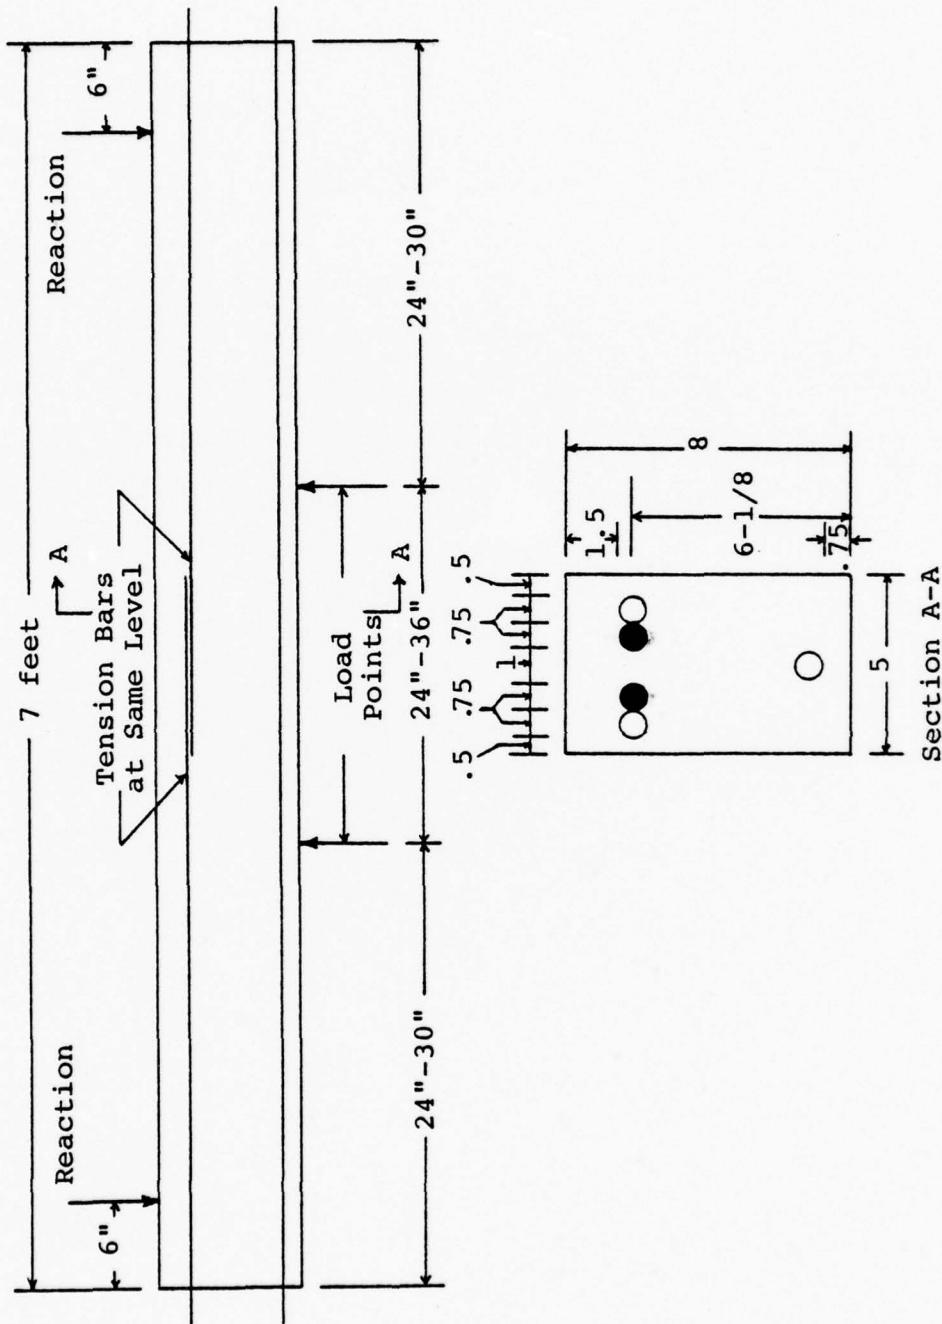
Nominal Beam Dimensions (Inches) and Reinforcement Location.
